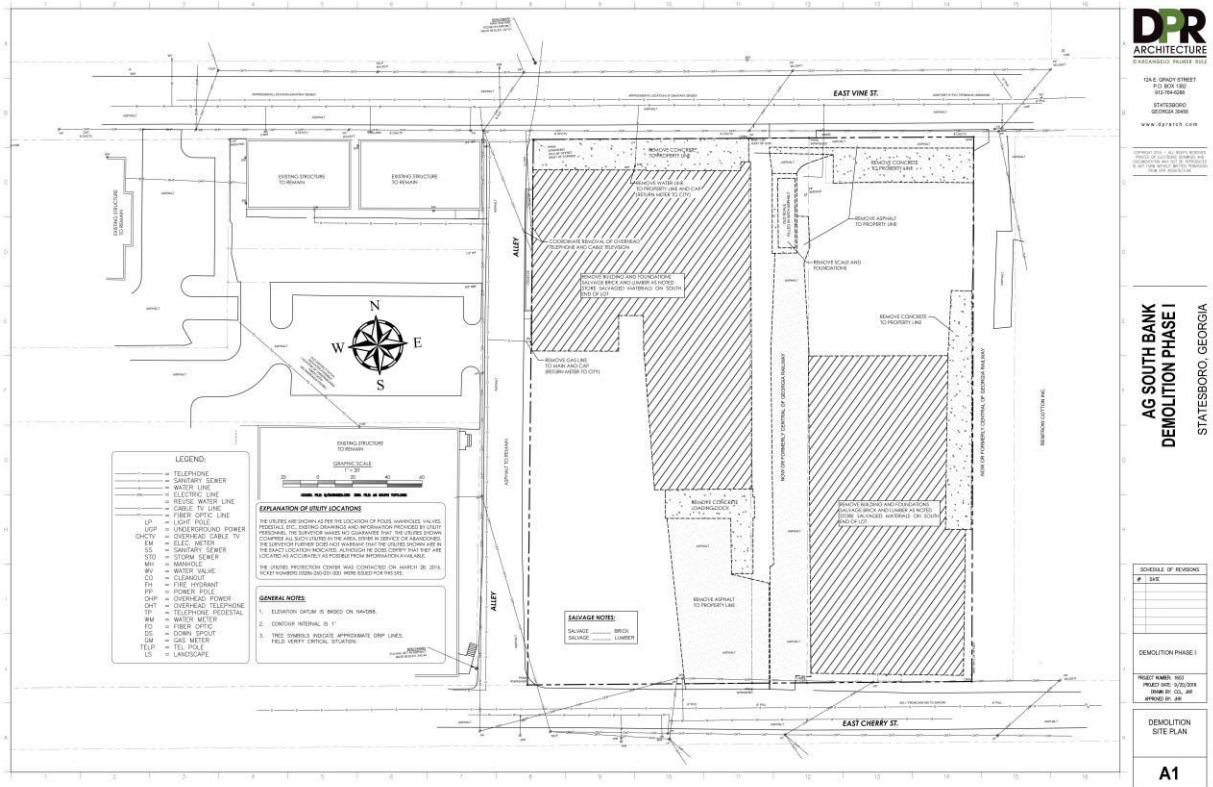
EXHIBIT B: AGSOUTH FARM CREDIT DEMOLITION PHASE I SITE PLAN
